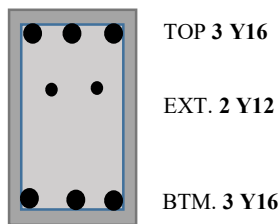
Area of Steel Required in Floor Beams (For Story 2)
